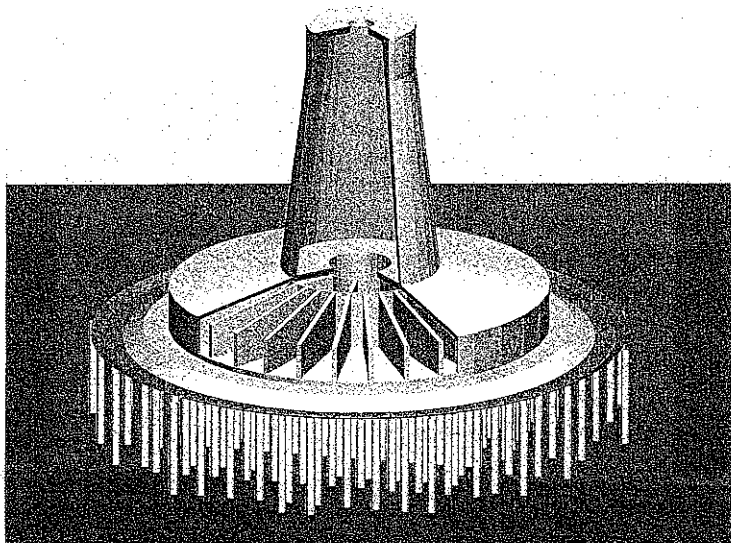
View of a reinforced soil foundation (Dumez-GTM).
